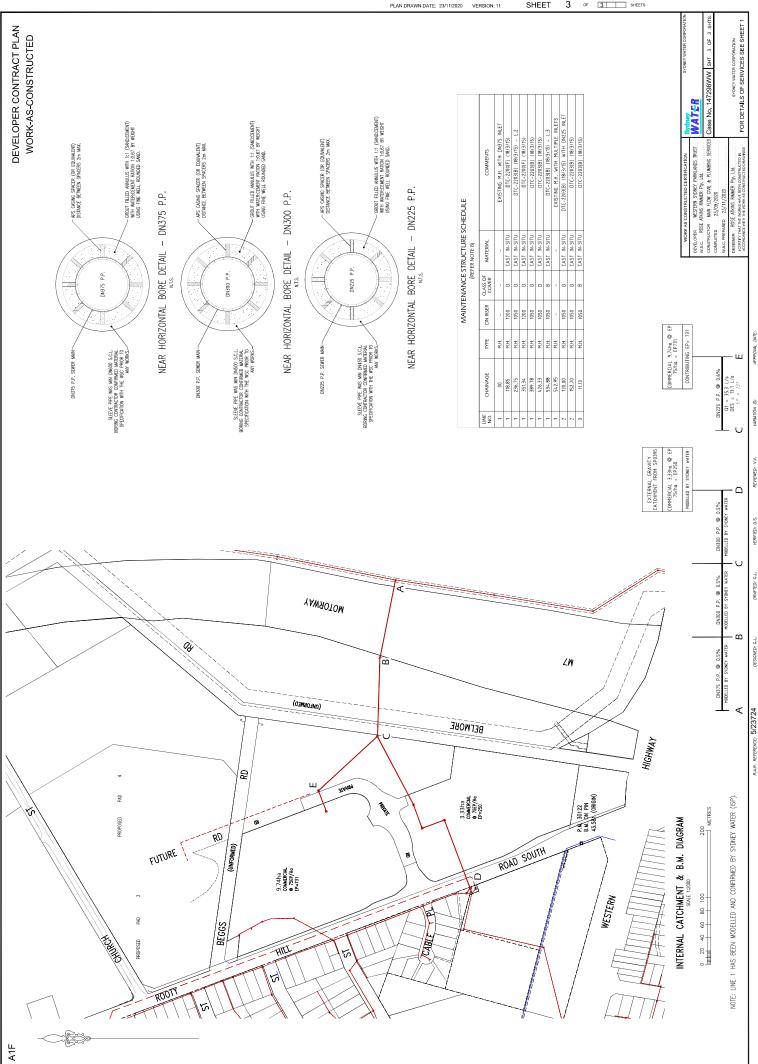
Work As Constructed drawing for case 147298WW from which a future sewer extension is required to service the Lot 3 Development. Source: Work As Constructed drawing completed by Rose Atkins Rimmer (infrastructure) Pty Ltd
